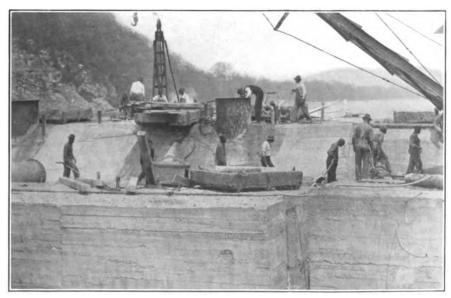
Fig. D.—Hales Bar dam. The crevices between adjacent caissons were raked out and filled with concrete.
